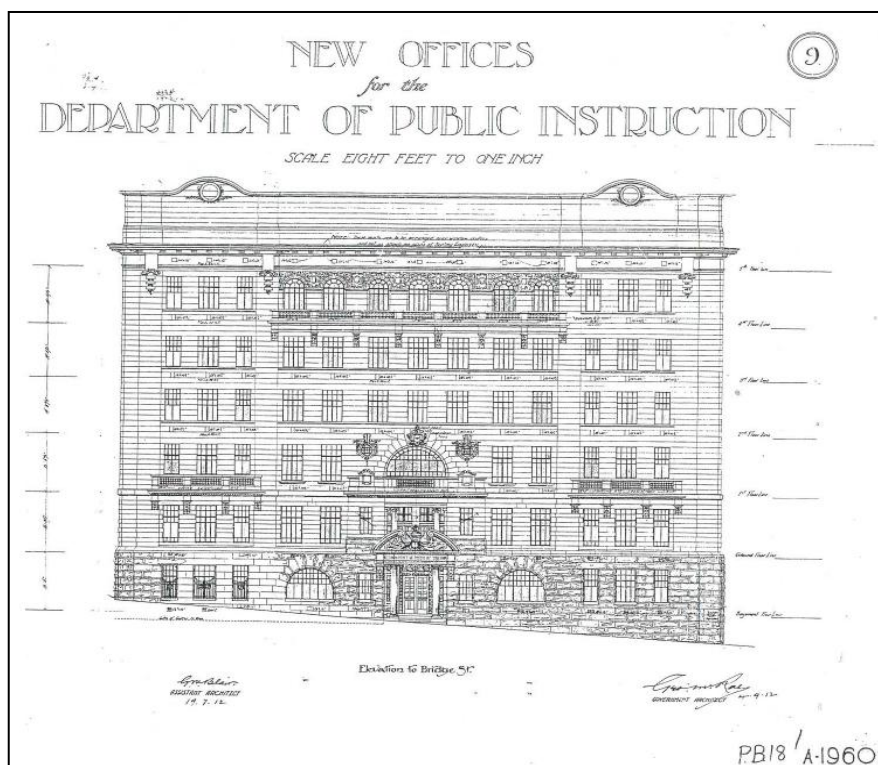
Elevation to Bridge Street; signed George McRae, Government Architect and G M Blair, Assistant Architect.
